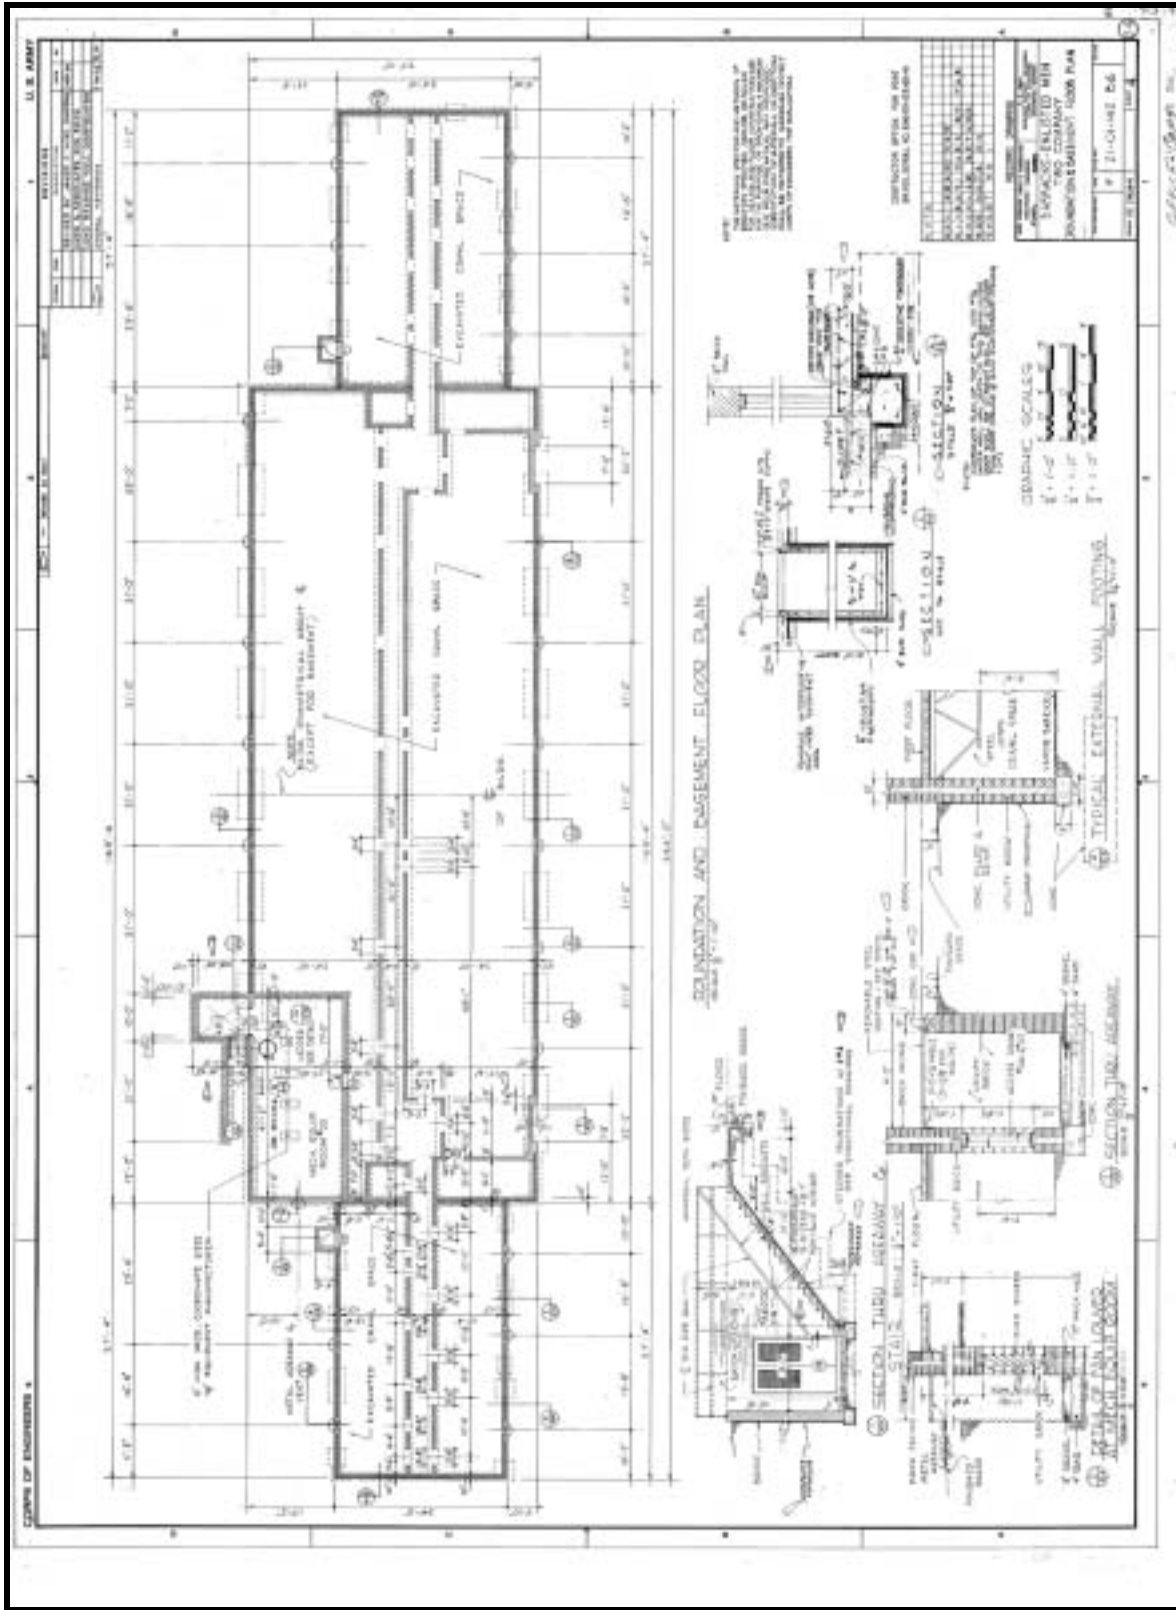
Rolling Pin, two-company barracks, foundation plan, Ft. Bragg (ca. 1959, revised 1966) (Engineering, Ft. Bragg).
